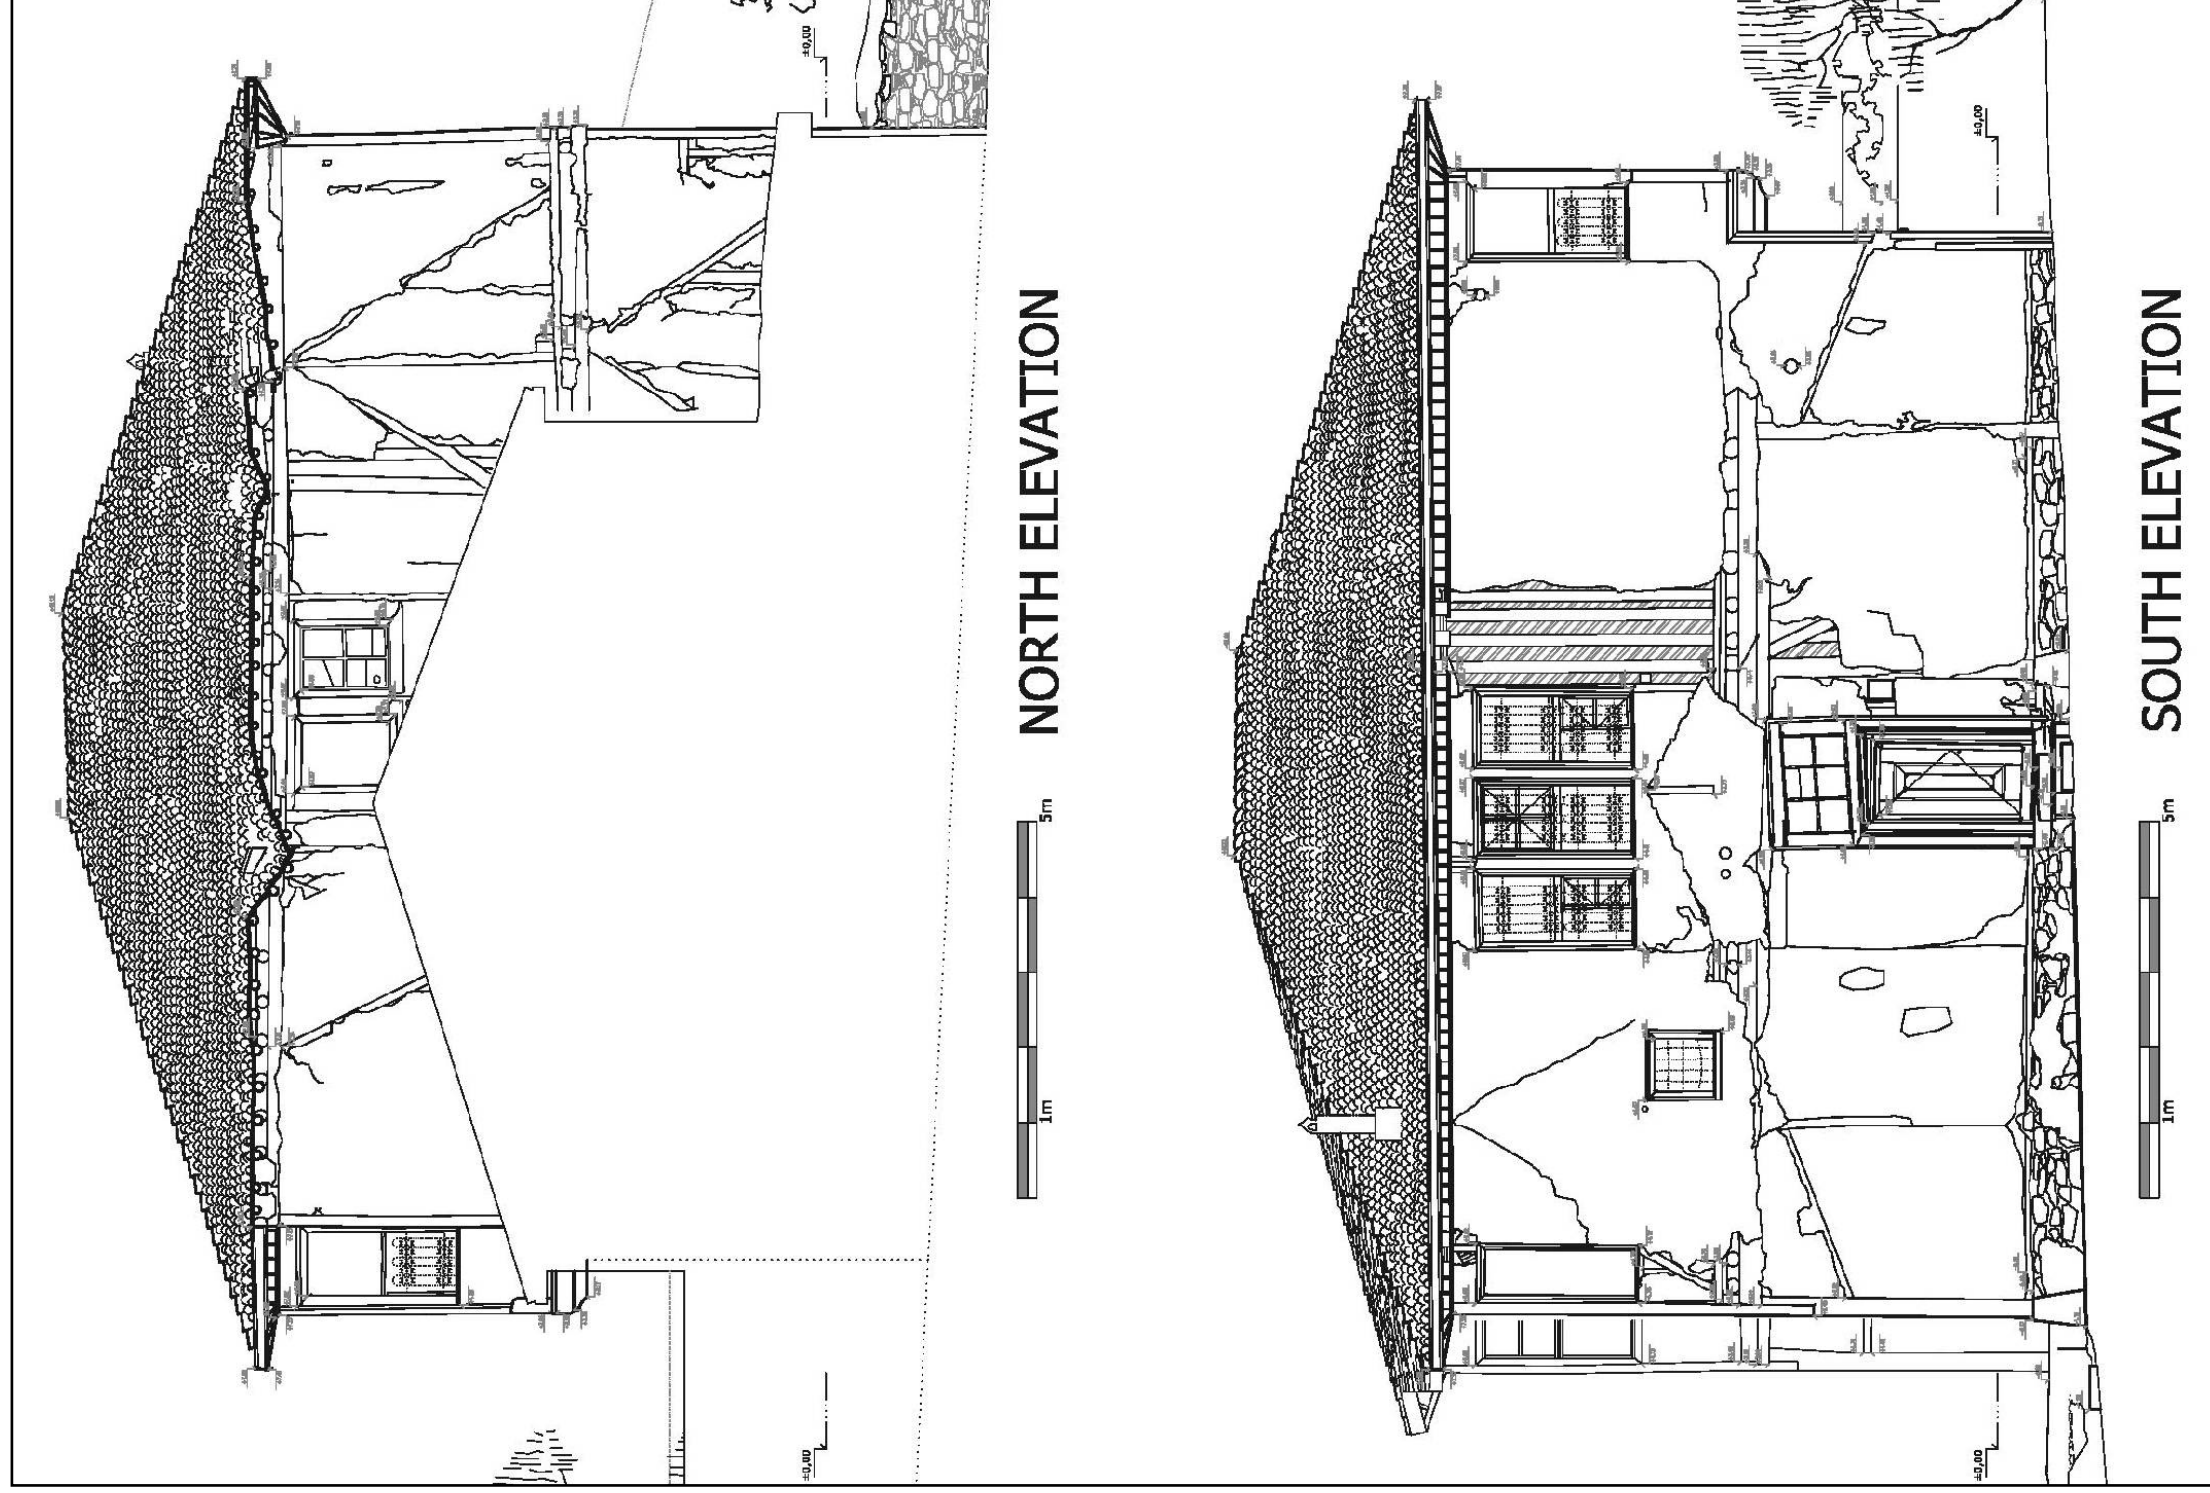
North and South Façades: 1/100 (presented in 1/50 at Jury)
